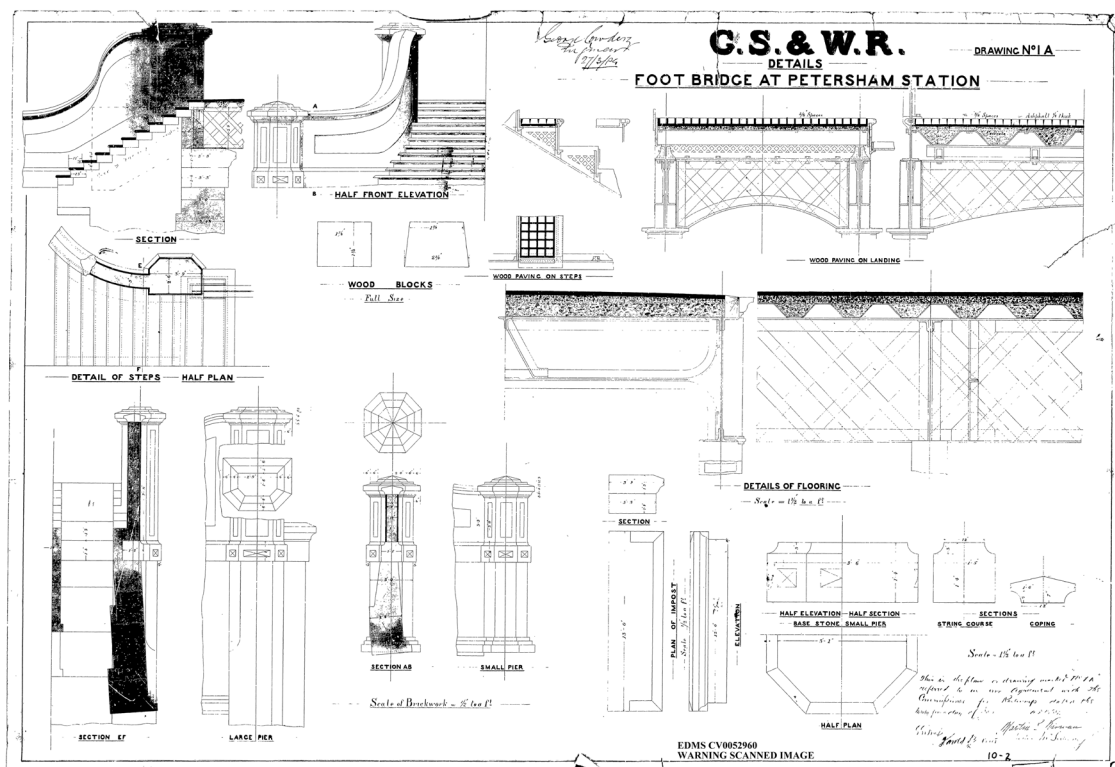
Footbridge at Petersham - side elevation plan 1883. Source: TfNSW
